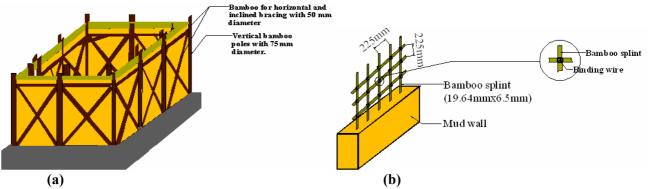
(a) Strengthening of Existing Mud House (b) Techniques for New Mud House
